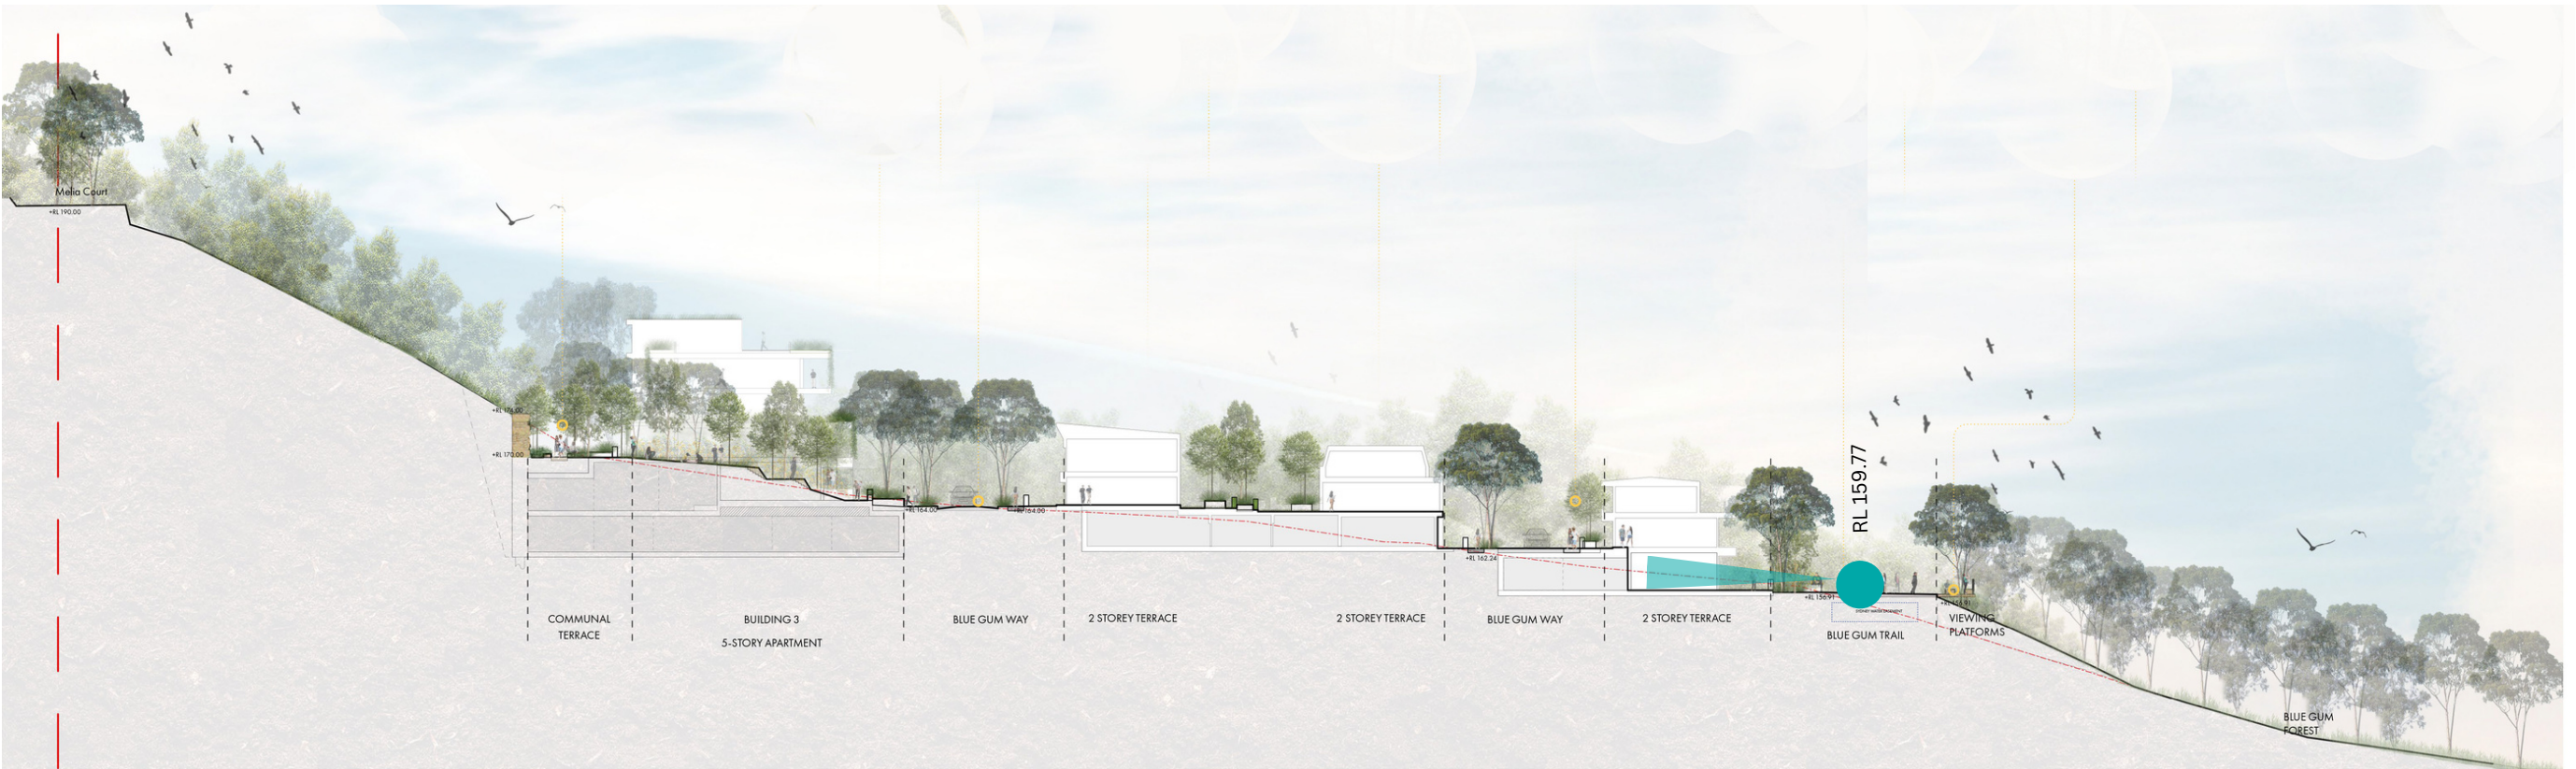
View Location relative to site's topographical level – Adapted from Landscape Architectural Planning Proposal Report – Courtesy of Land And Form
